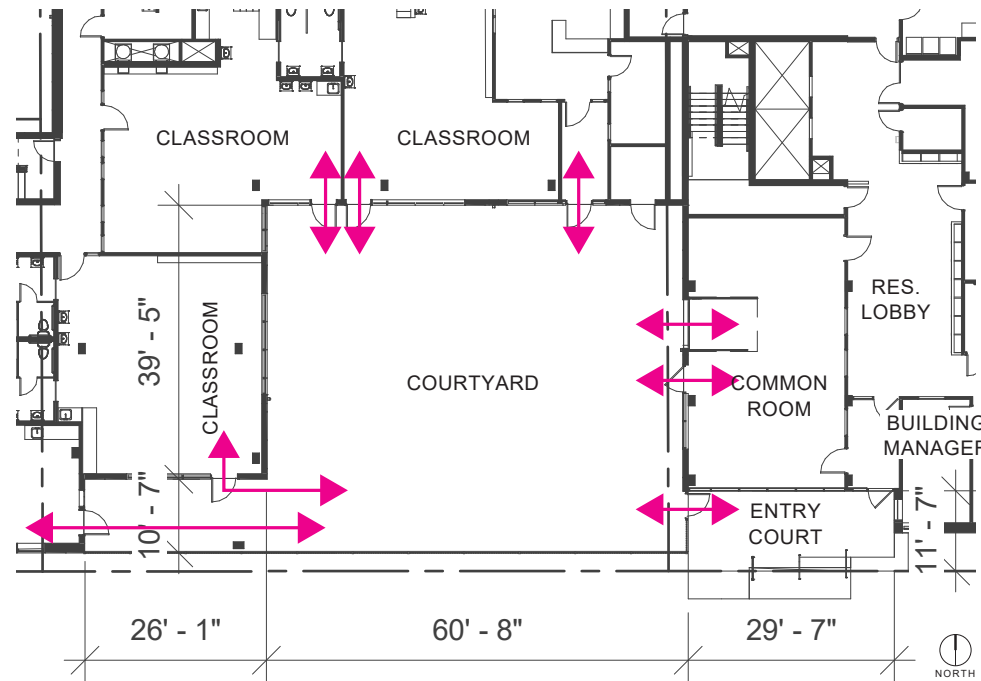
Plan showing courtyard space and points of ingress, all individually controlled for access by building staff.
